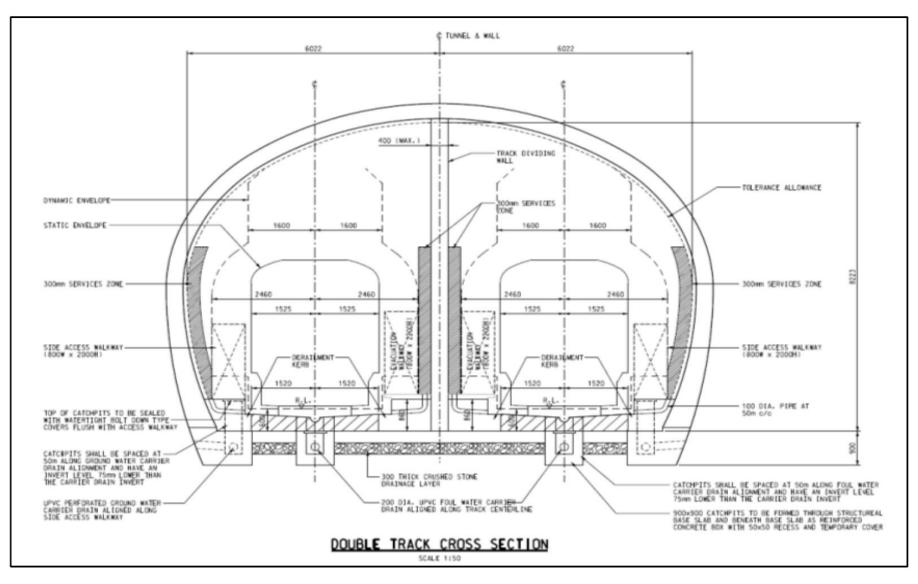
EXAMPLE OF A TWIN TRACK RAIL TUNNEL CROSS-SECTION (AURECON; 2014)
